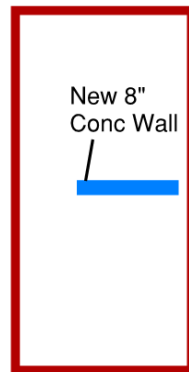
Figure showing Retrofit Situation 2a plan.
